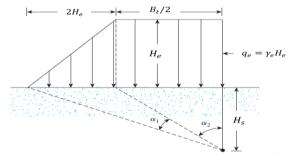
Stress Reduction Due to Embankment loading considering 1V:2H Side slope [3]
